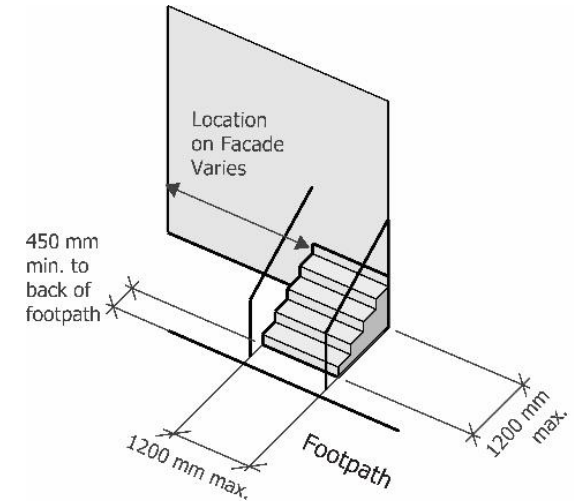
Diagram showing parameters for permitted front stair entry projections
